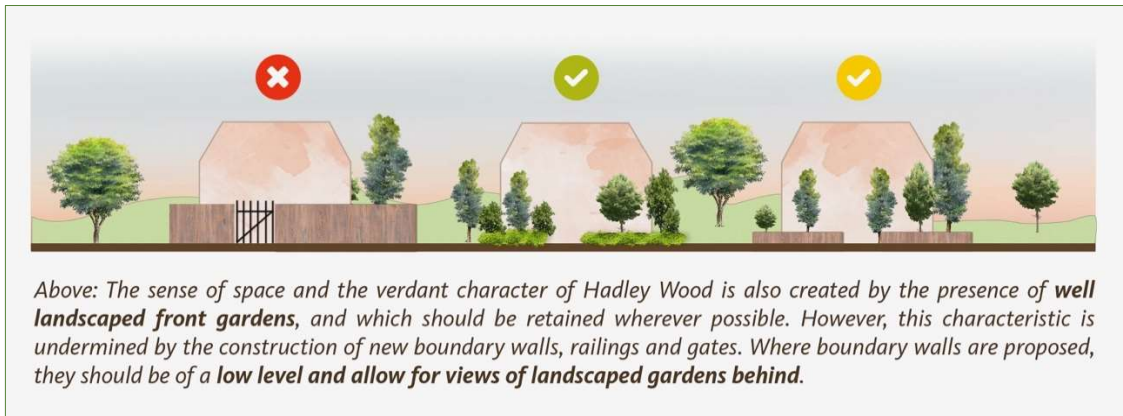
The open nature of the street scene in Hadley Wood should be retained wherever possible (source: Troy Planning)
